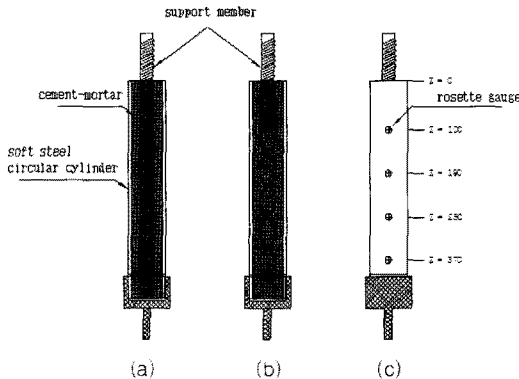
Specimen for pull-out test of rock and spiral bolts installed in a thin-walled hollow cylinder with grouting.
